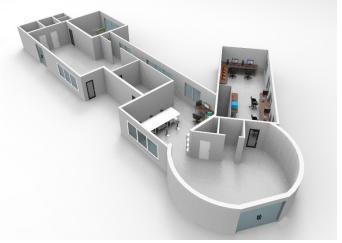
3D model of sea container Fab Lab on the ground floor
